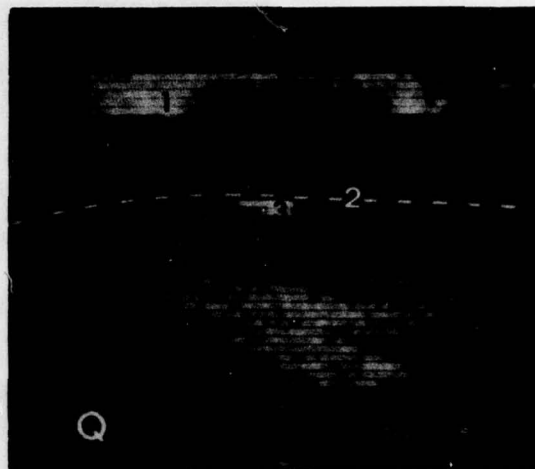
Thermogram of egg-shaped anomaly on the State House Annex roof (1 – parapet, 2 – boundary of anomaly, 3 – rectangular pitch pocket on roof).
